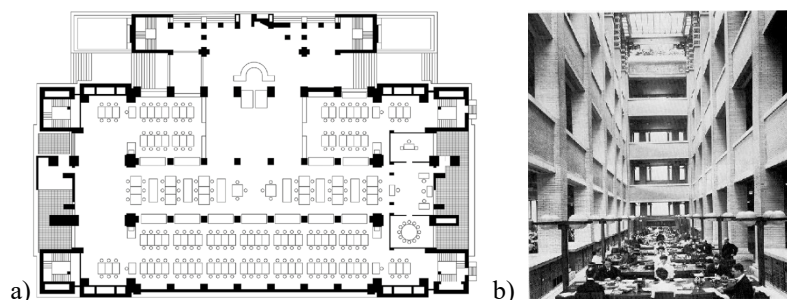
a) 1st floor layout for Larkin Building (1904-1945), Frank Lloyd Wright 4.[16] b) Open plan offices in the atrium of Larkin Building (1904-1945), Frank Lloyd Wright 4.[20]
